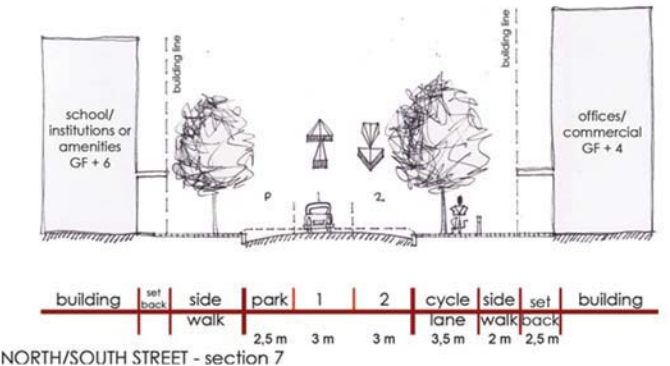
A typical section through a north/south street indicating overhangs, sidewalks and cycle lane
